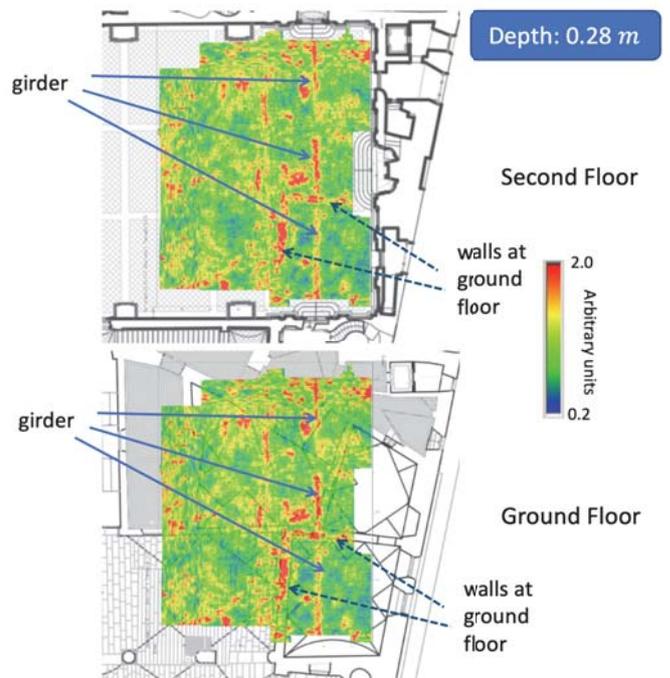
C-scan at 0.28 m C-scan at 0.23 m superimposed to the maps of the second floor and the ground floor
